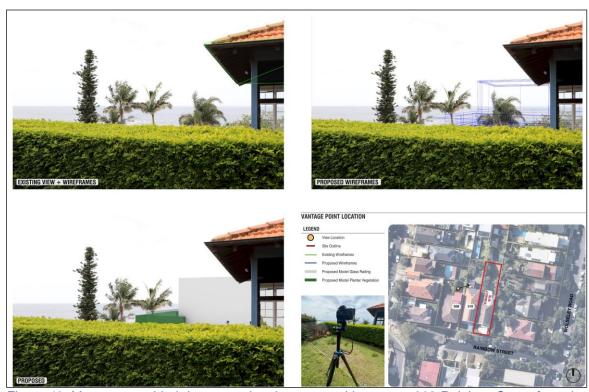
Montage provided demonstrating the expected impact on 308 Rainbow Street from the rear garden (Panorama View) (Source: AE Design)
